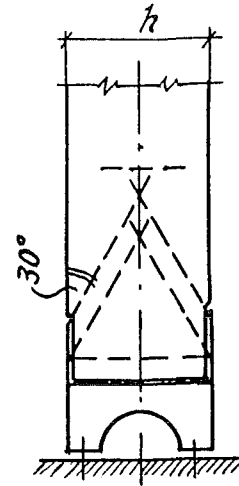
Joint of column with foundation (Tukovsky, 1991)
